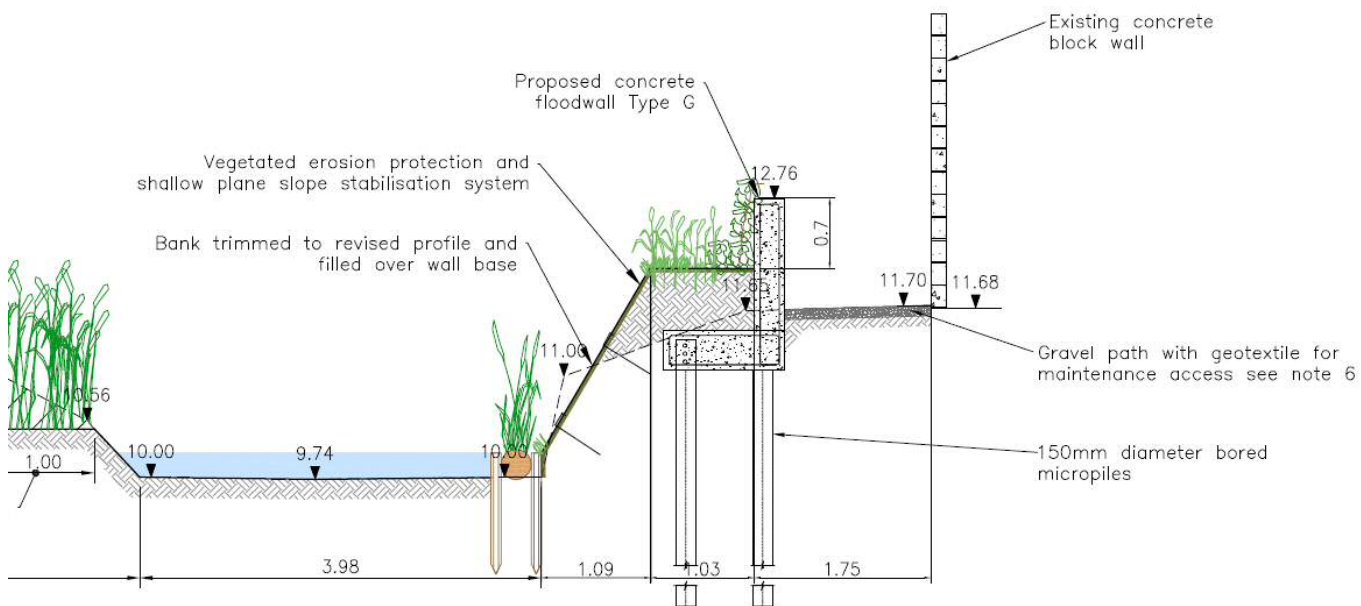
Cross section I-I – Reinforced Flood Bank with Piled 'Type G' Flood Wall
